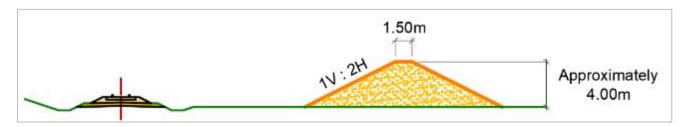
Dimensions of the Proposed Noise Barrier
